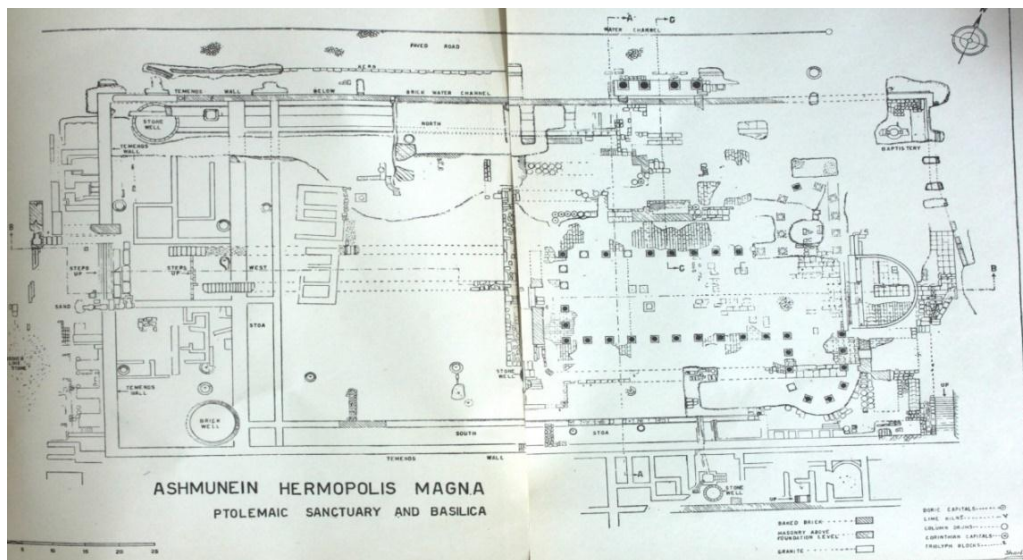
Plan of the Basilica and the Ptolemaic Sanctuary, showing the water conduits in the *Antinoe* Street, After: Alan Wace, (1959). Plate 2.
